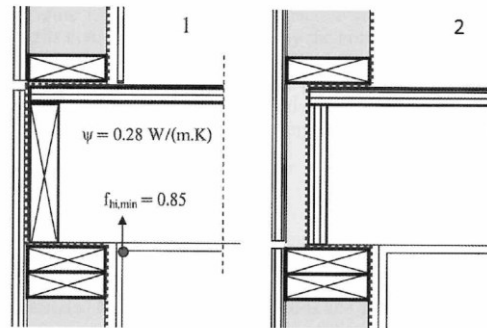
Timber-framed outer wall: adapting header plate design to avoid thermal bridging.
